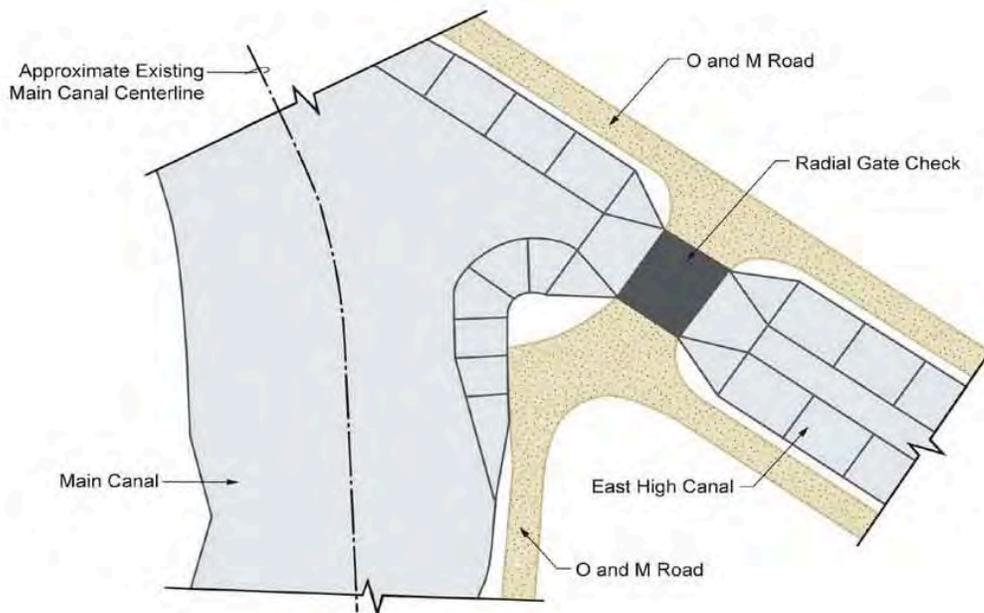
25. East High Canal headworks structure – conceptual site plan
